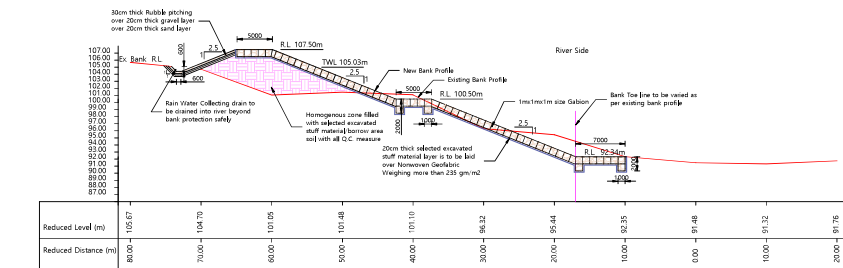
(B) TYPICAL CROSS SECTION OF HIRAPURA BARRAGE GUIDE BANK - D/S LHS @ CH. 180 m
